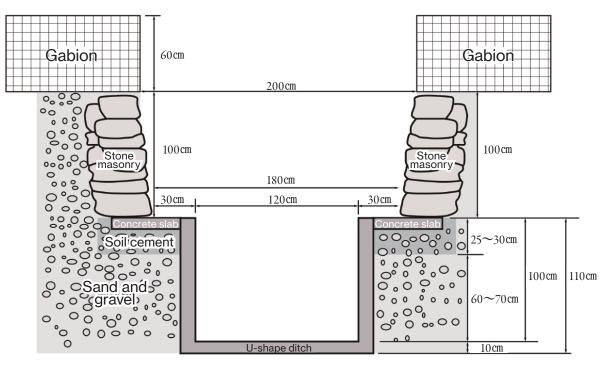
Cross-sectional Drawing of U-shaped Main Drainage Canal³⁾
